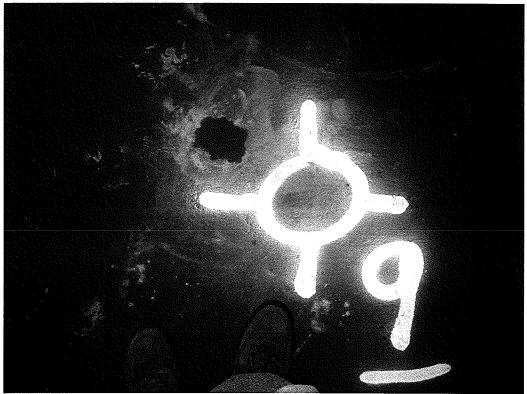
, Concrete patch on concrete floor after collection of soil-gas sample SG-9.
